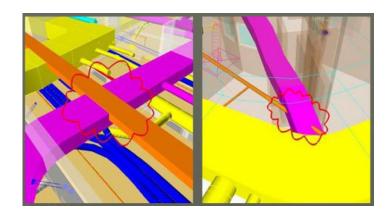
Clash detection between structural and MEP models (Salah, 2014)
